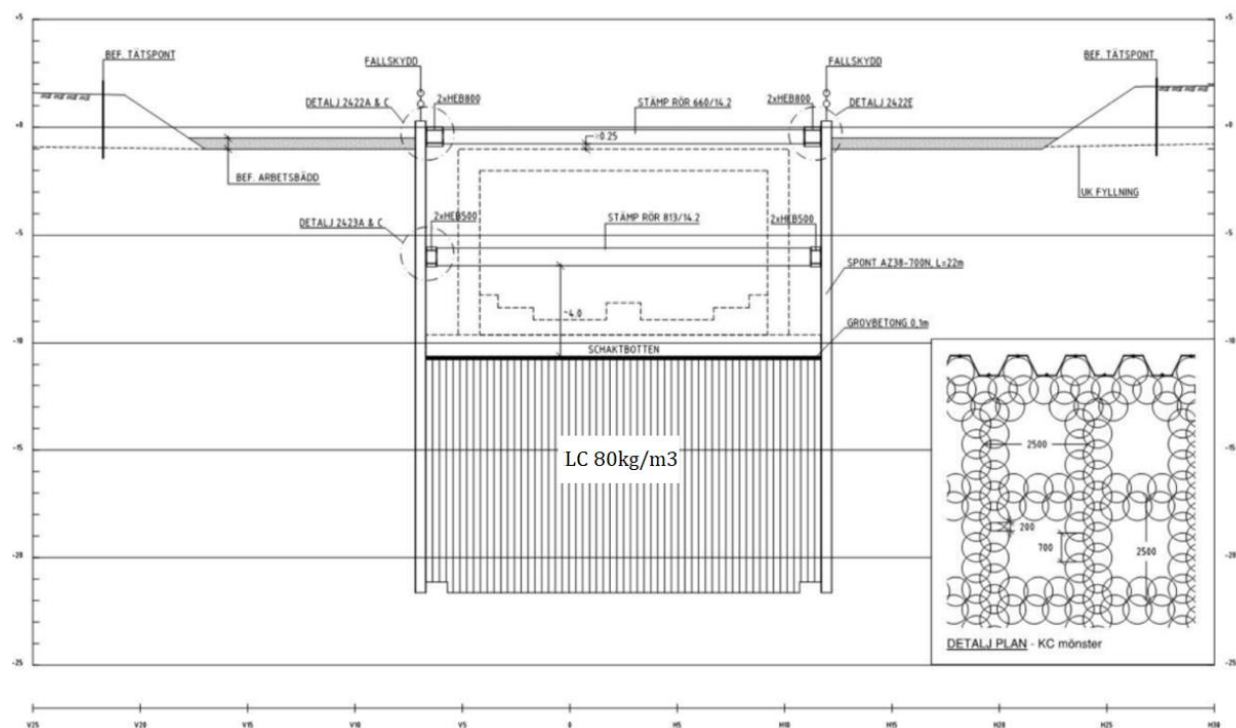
Cross section of the excavation, LCC grid formation in the down right corner (Wood, 2018).
